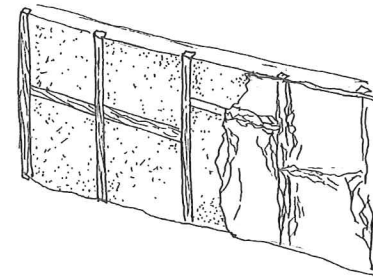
Ceilings and Wall Plaster (7.3.1-11).
